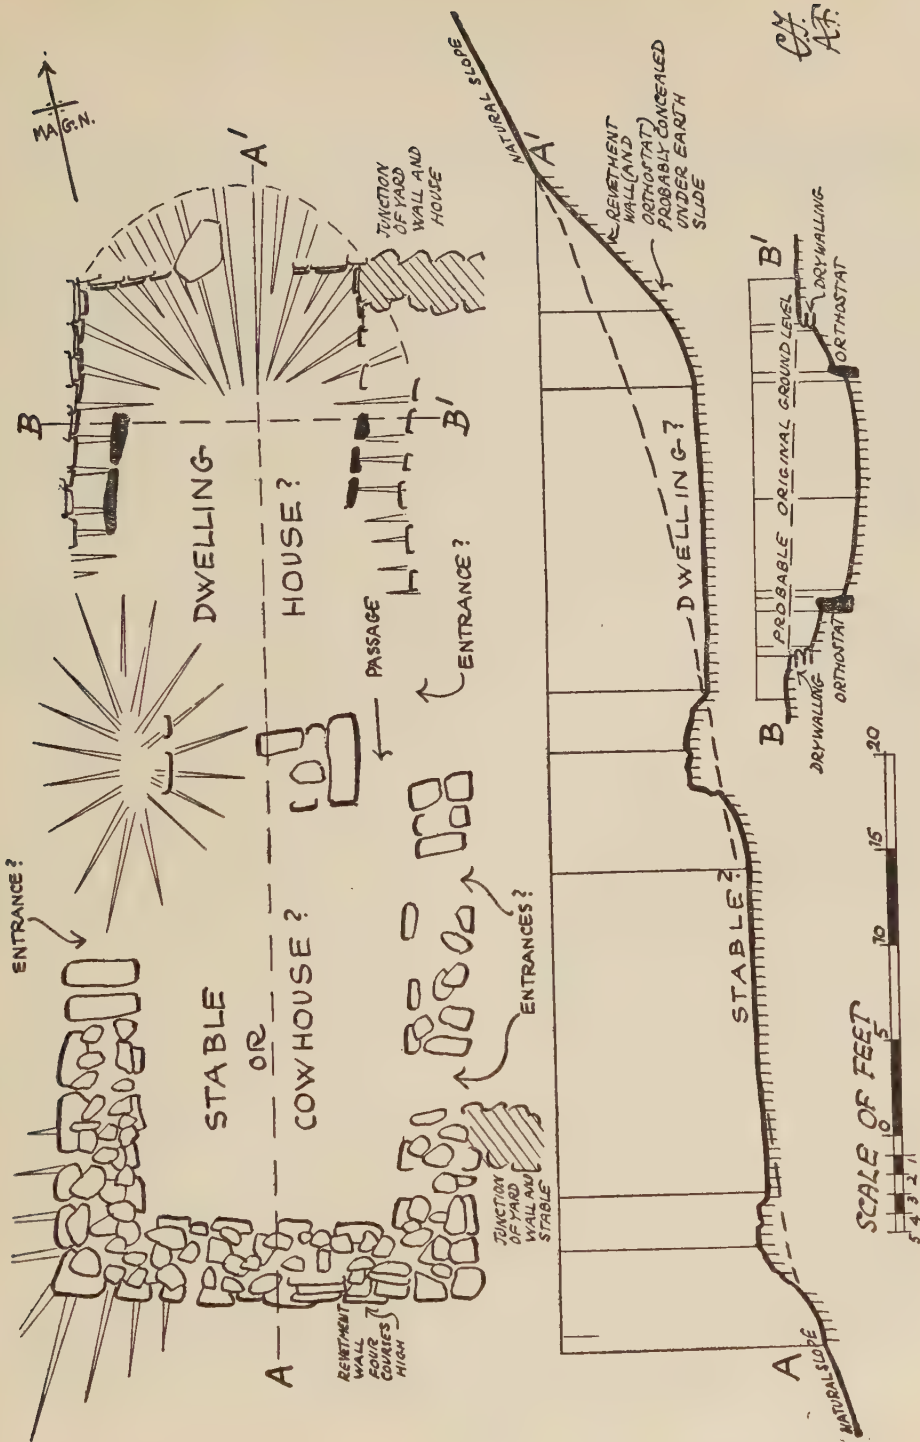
SKETCH PLAN AND SECTIONS OF THE BUILDING, NANT-Y-MOCH (see pp. 366-8)
